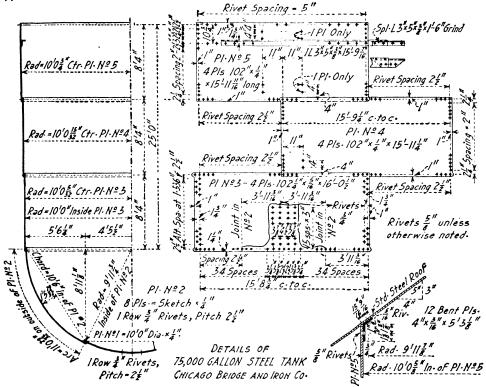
DETAILS OF TANK AND HEMISPHERICAL BOTTOM. CHICAGO BRIDGE & IRON CO.
